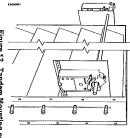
Tandem Mounting on Each End of Damper Shaft.
